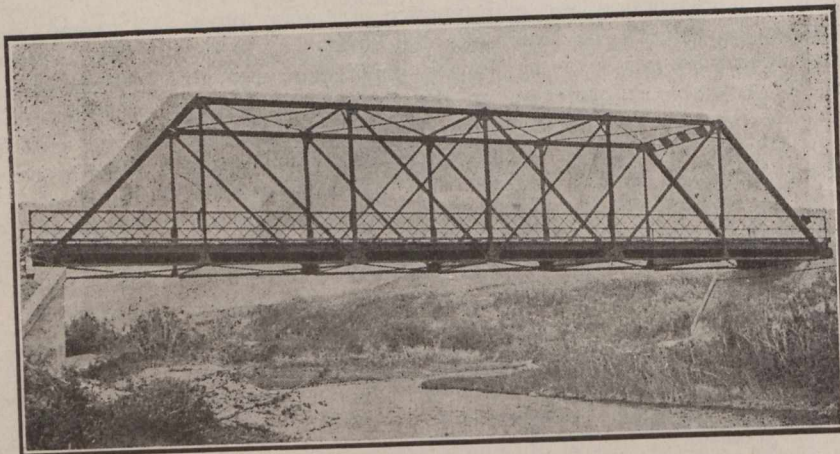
A 100-foot Steel Span on Concrete Abutments Over Eagle Creek, Sask.; Typical of the Steel Highway Bridges of the Province.
